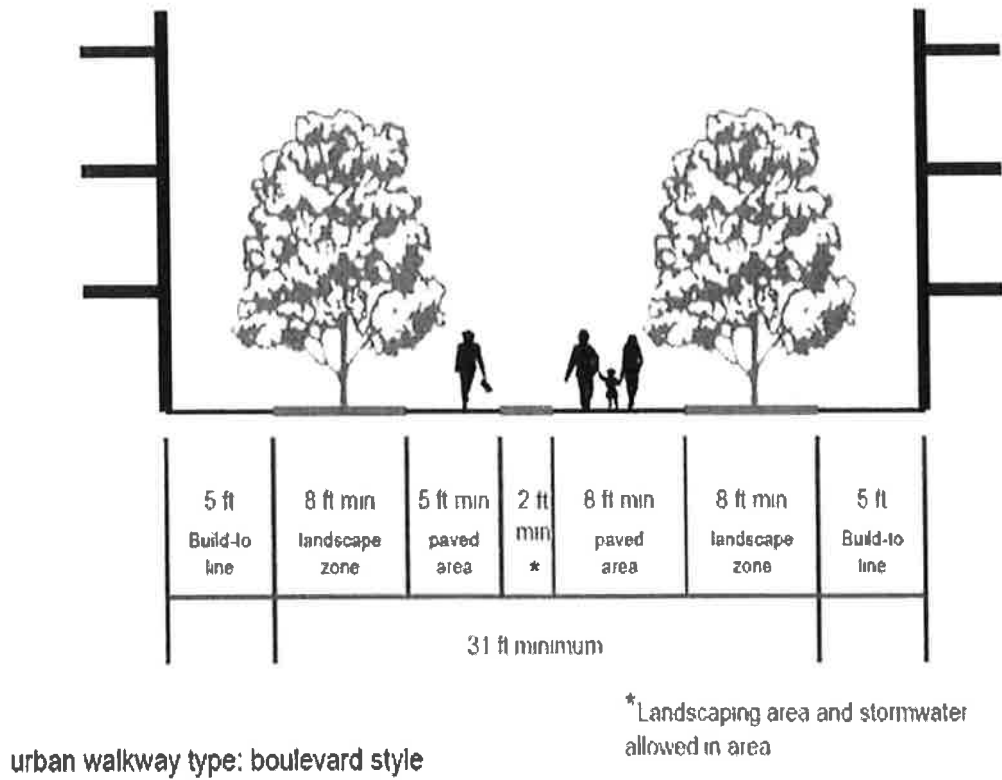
Public Realm Requirements—Boulevard Style Urban Walkway
